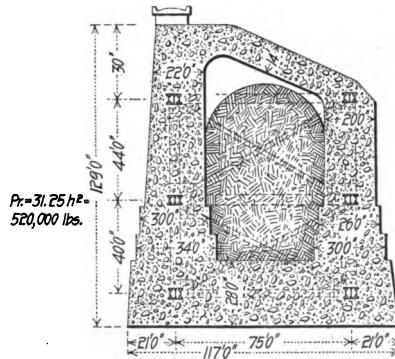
Proposed Design for Hollow Concrete Dam.
